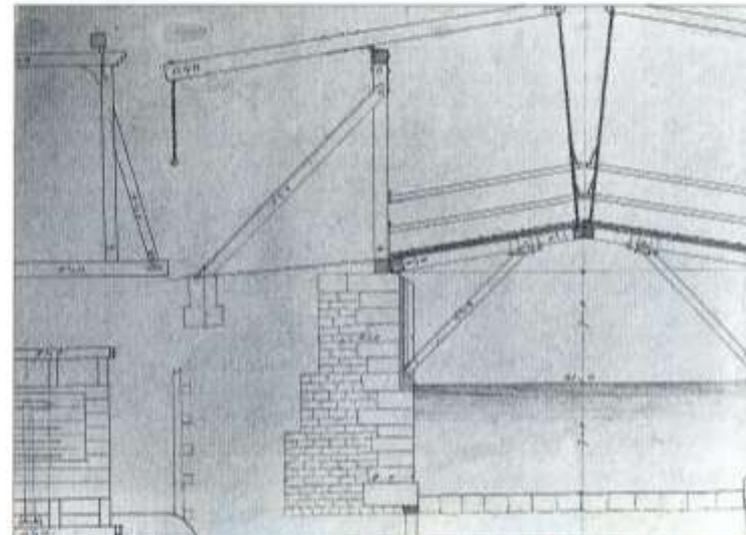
Typical two-leaf drawbridge over the Forth & Clyde Canal.³⁴ None of the 33 original timber bridges remain.
